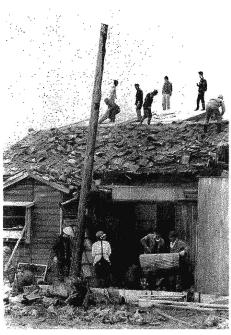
Damage to a wooden house. Removal of roof-tiles, doors and windows. (by courtesy of the Mainichi Newspapers)
